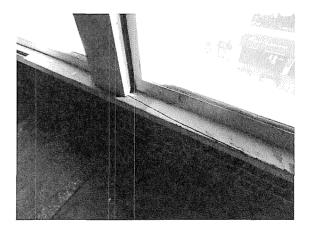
Detail photograph of split window sill (photograph taken on 02/27/2018)
